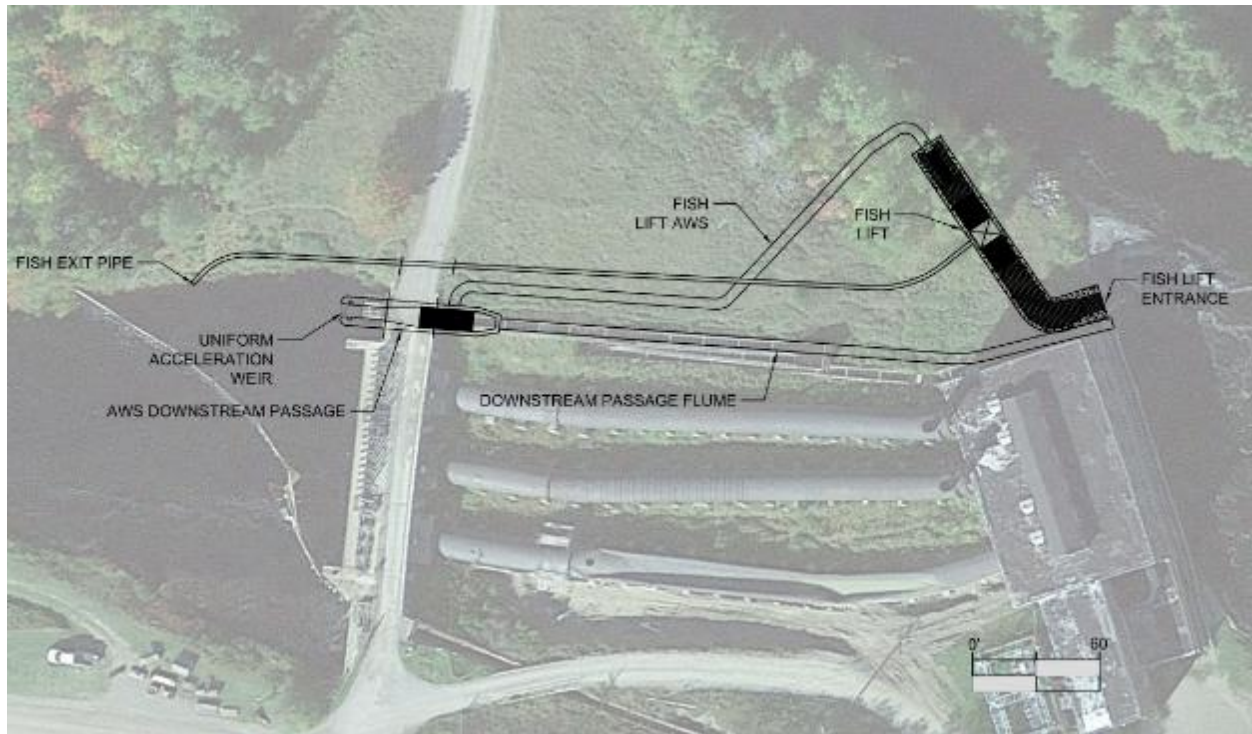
Conceptual plan for a fish lift at Grand Falls Powerhouse (source: Alden Labs)
